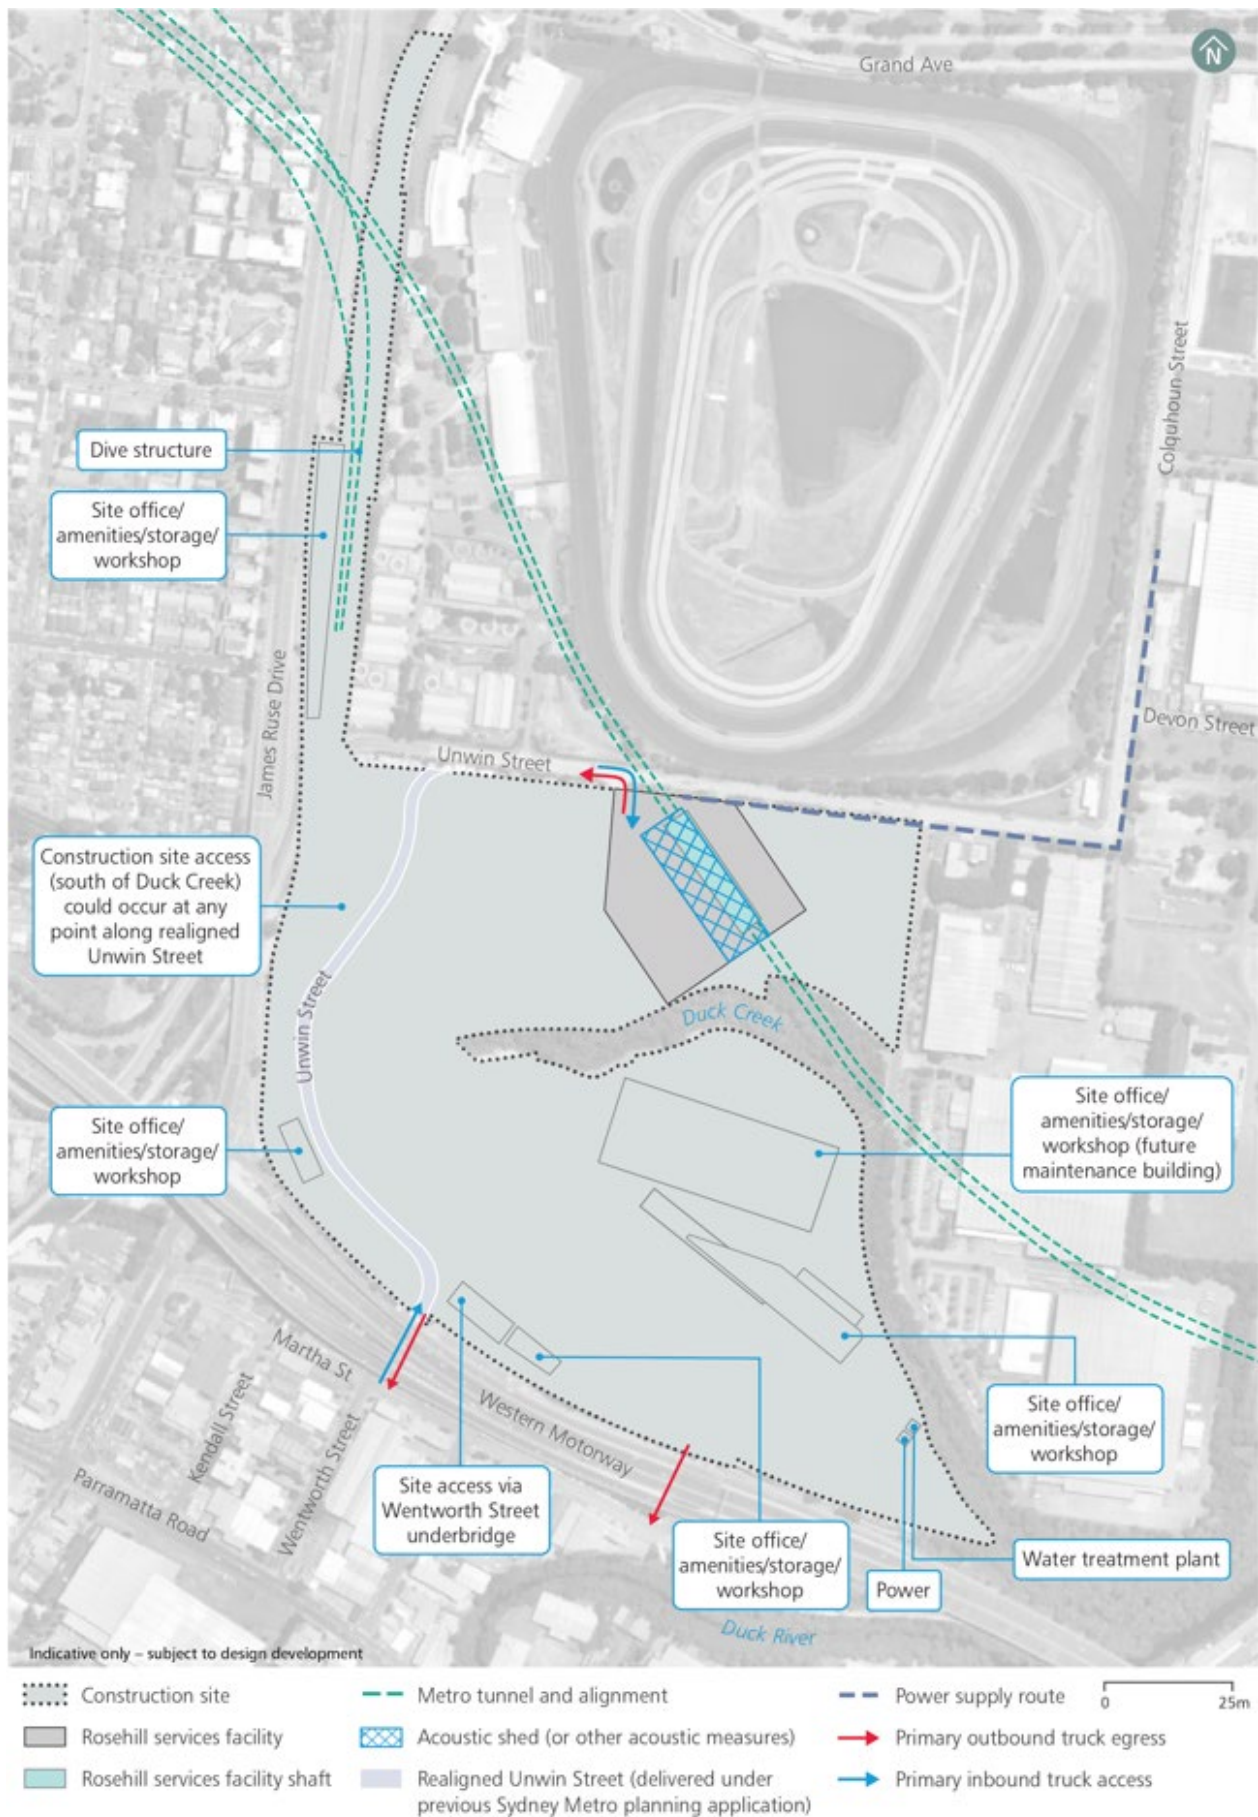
Clyde stabiling and maintenance facility and Rosehill service facility indicative construction site layout
